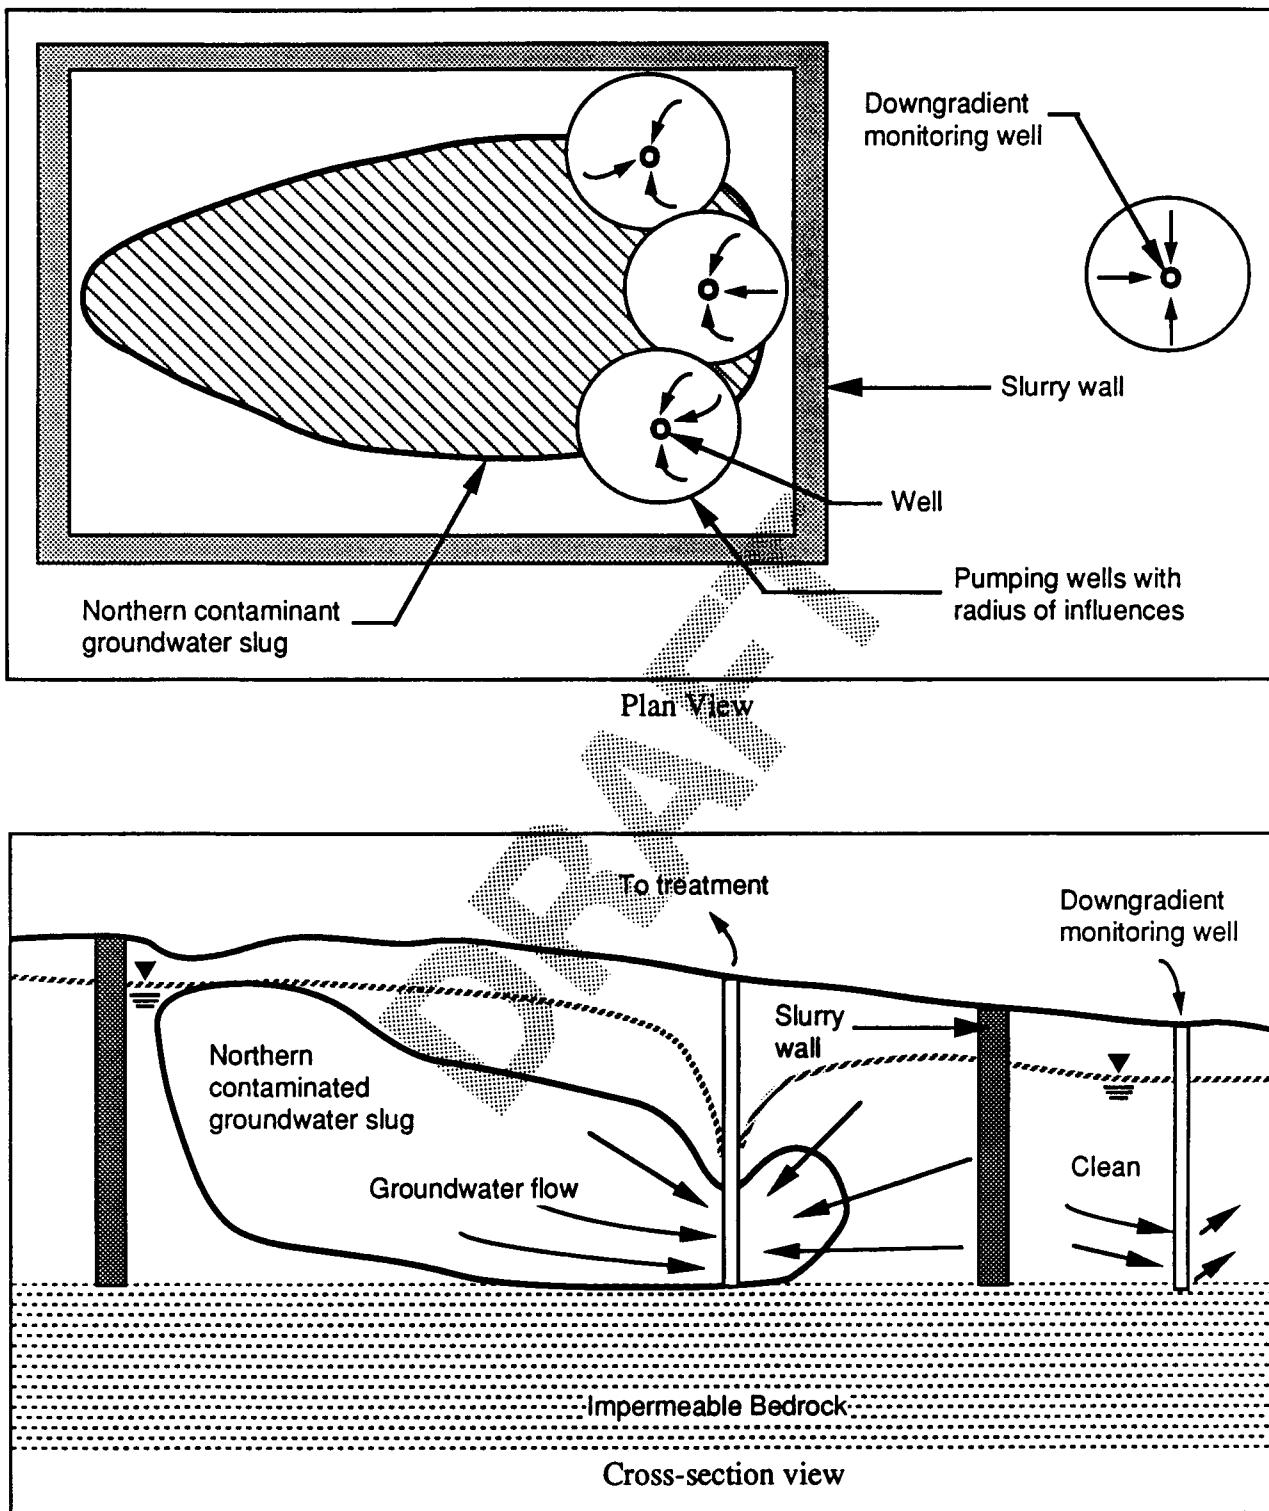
Typical slurry wall containment with a pump-and-treat system.
